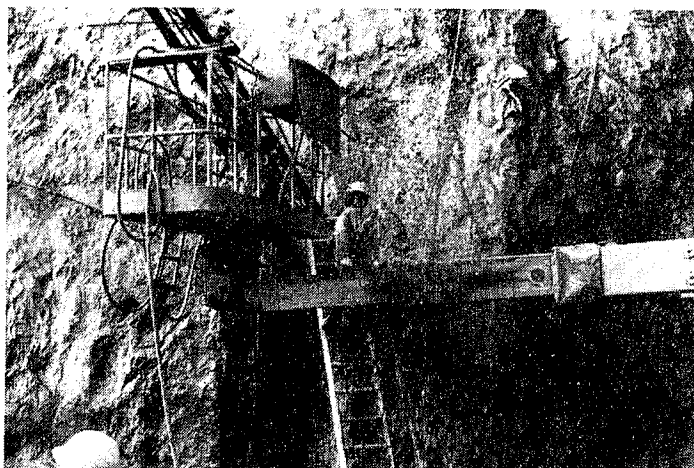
WATER JET DRILL MOUNTED ON MAN LIFT PLATFORM
